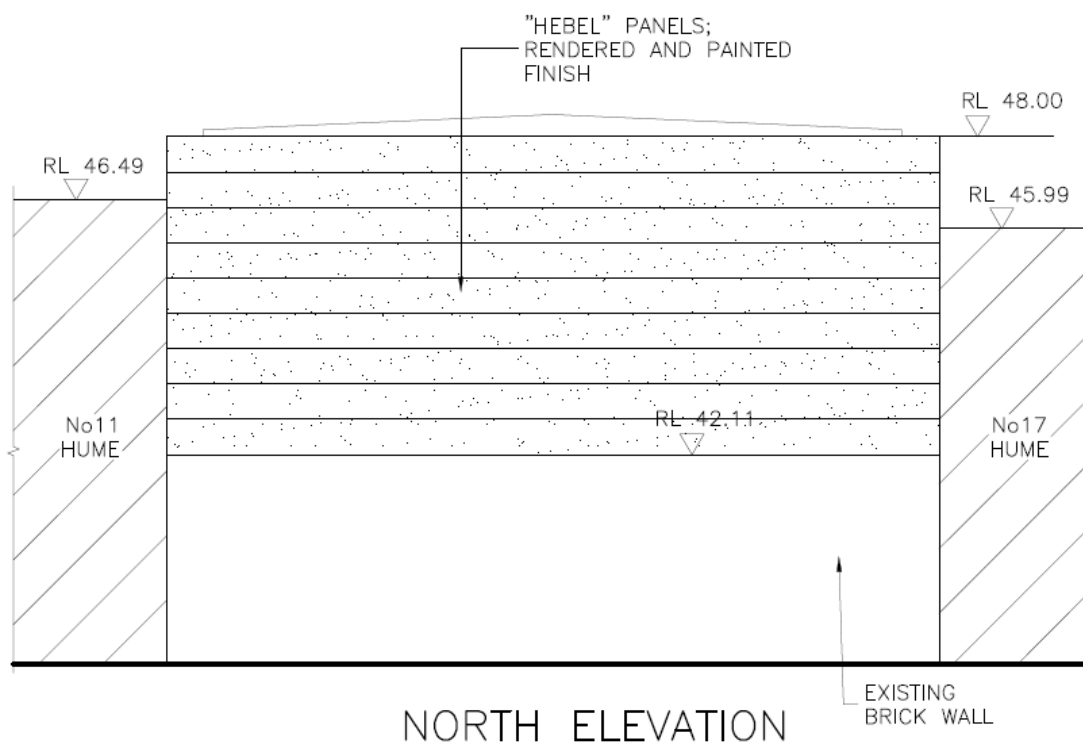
Northern elevation of proposed development conveying compatible building height relationship with adjoining buildings, well under the maximums allowable
